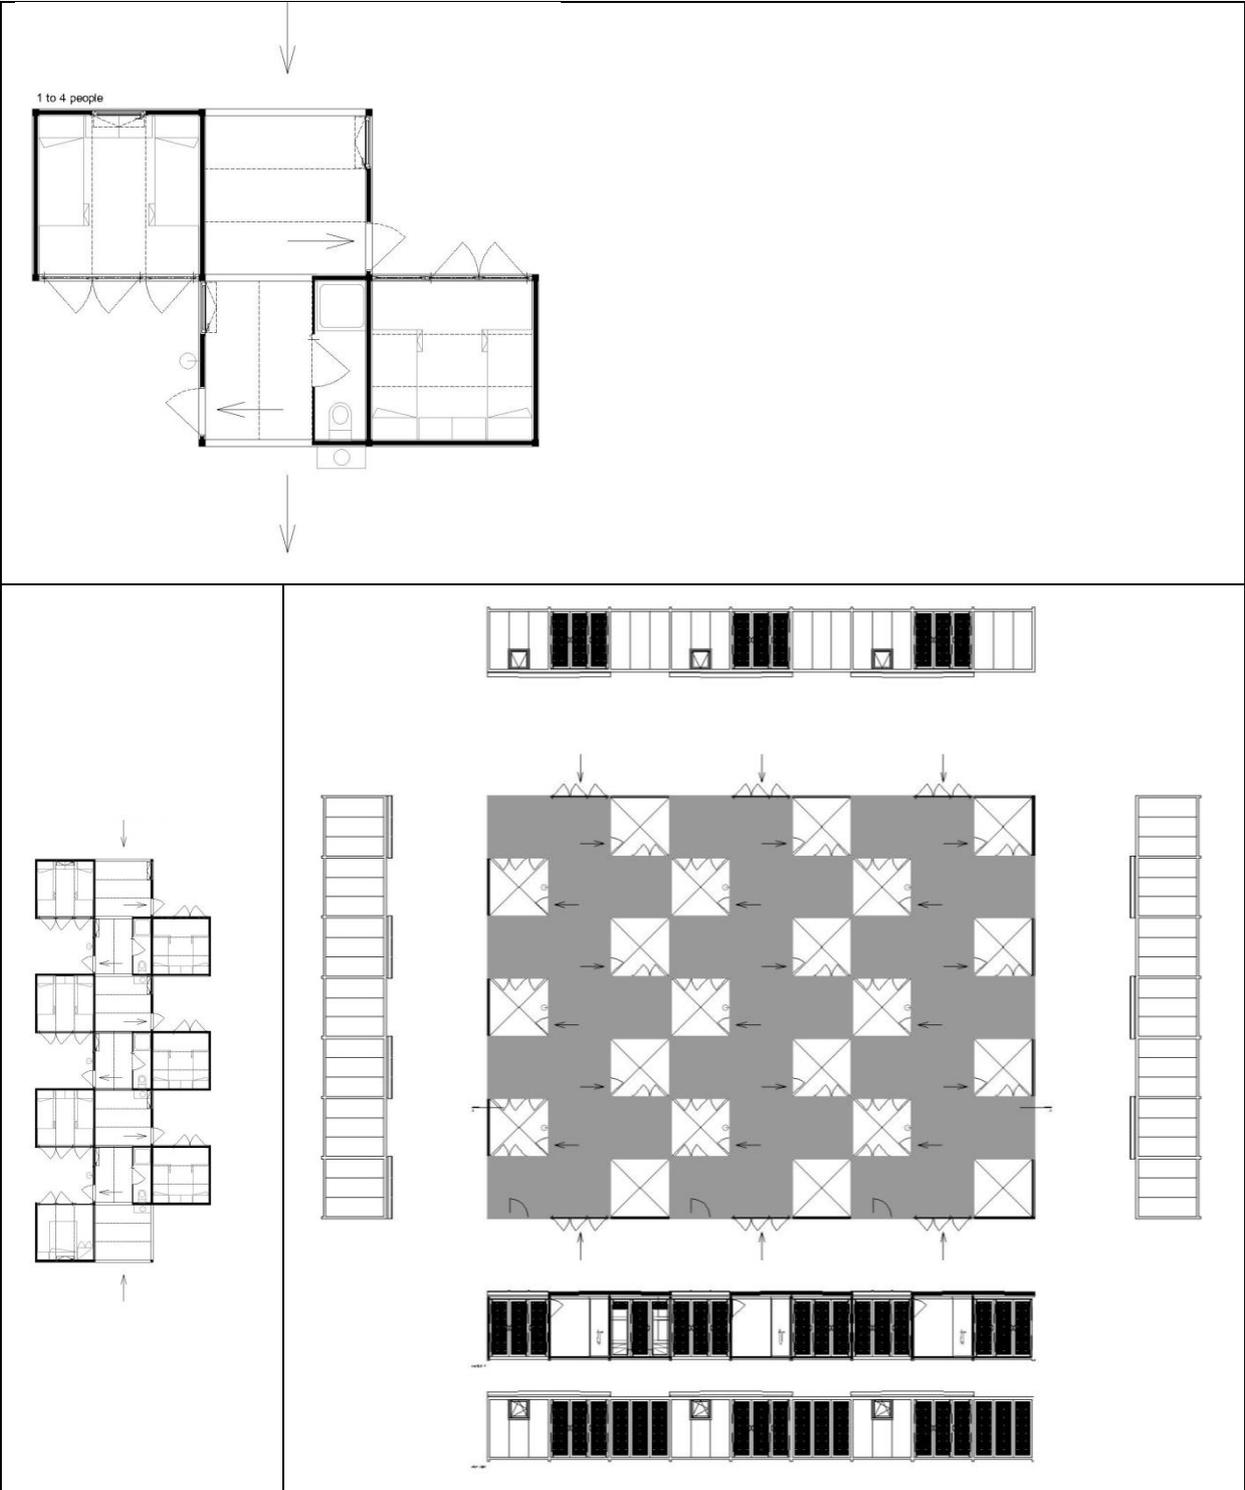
Settlement layout study for a “S –shaped cell” dorm. (Plan, section and elevations)
